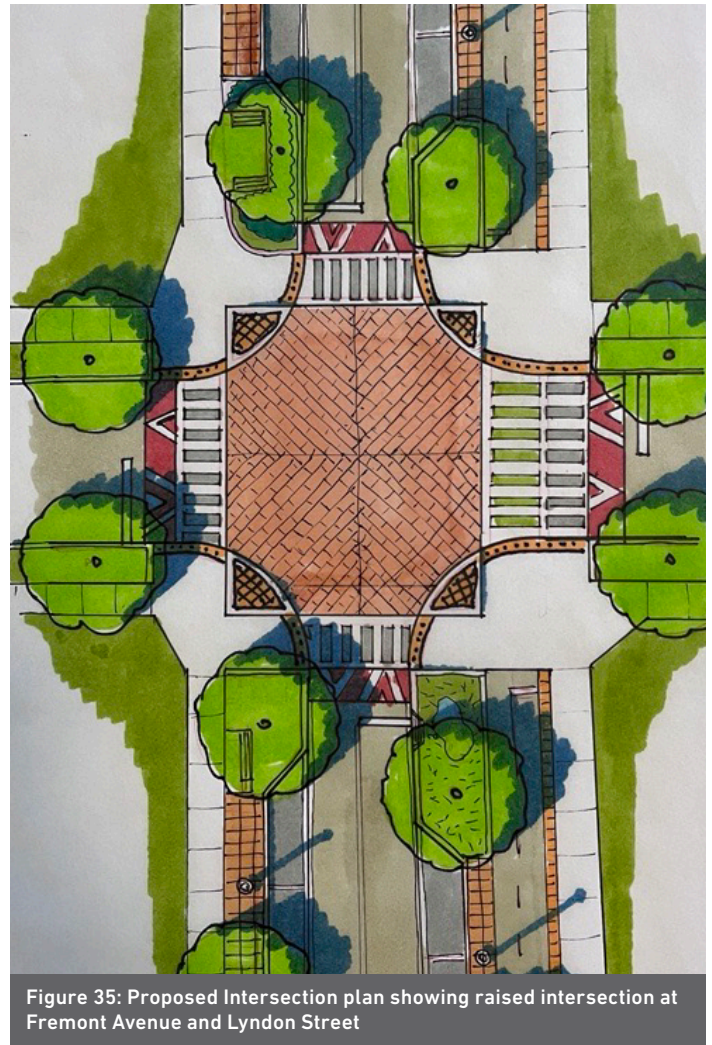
Proposed Intersection plan showing raised intersection at Fremont Avenue and Lyndon Street
